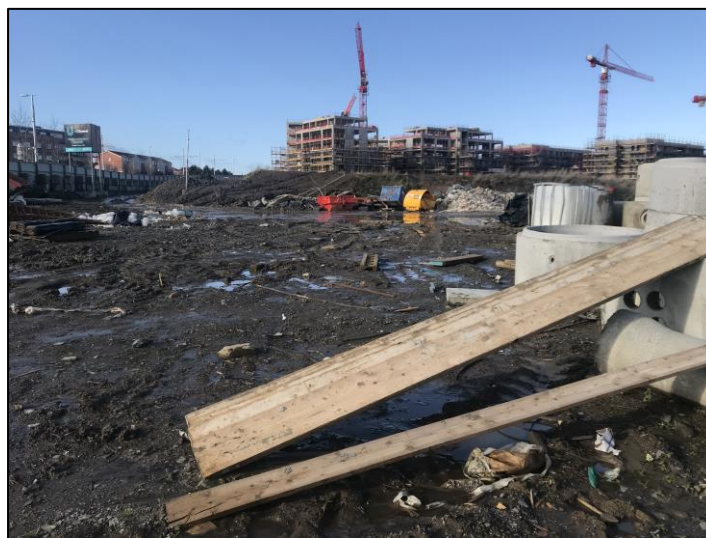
Southwest portion of the proposed development area, facing northwest
